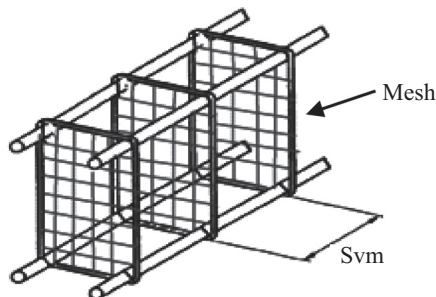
Reinforcement cage with mesh as transverse reinforcement replacing the conventional stirrups
